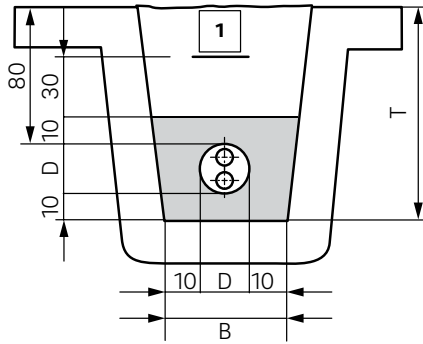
Trench width of individual pipe (UNO/DUO)
